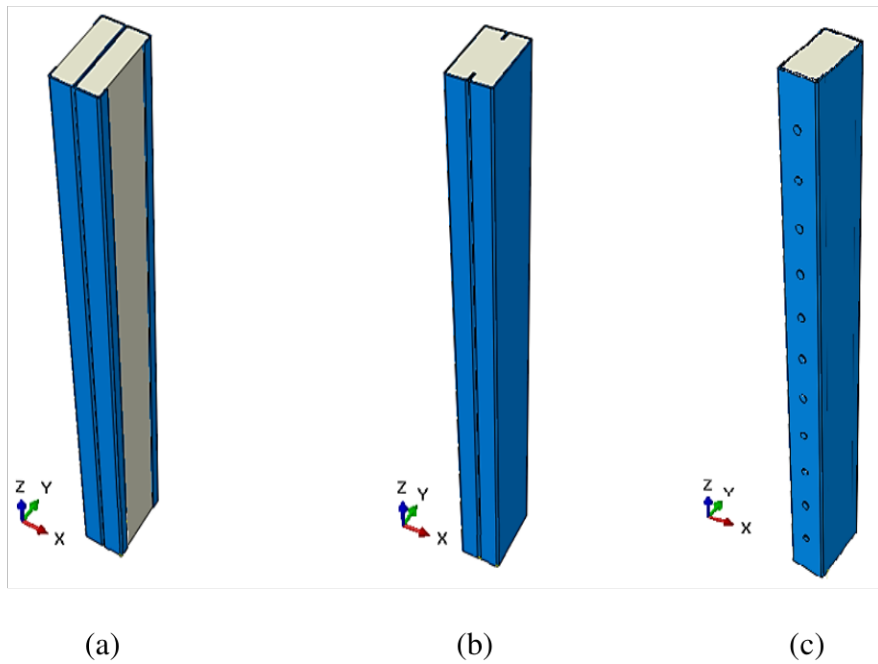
Numerical models of concrete-filled C-columns: (a) Back-to-back partially encased with concrete; (b) Face-to-face filled with concrete; (c) Box filled with concrete.
